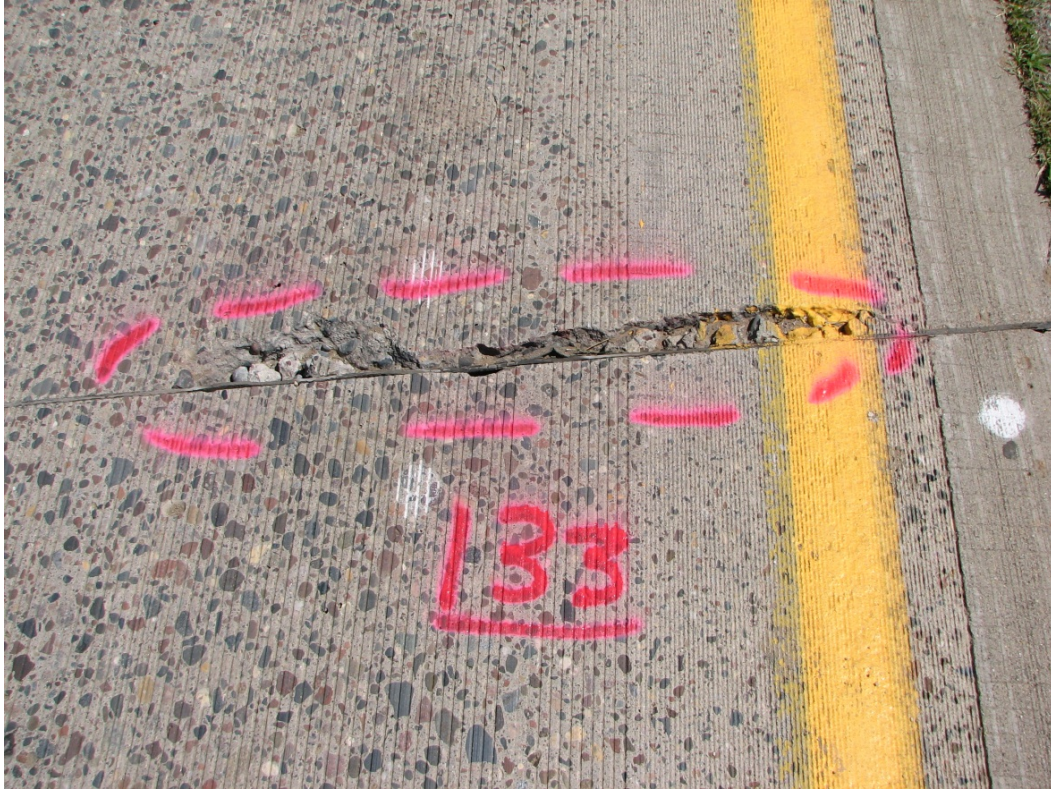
Distress near the surface of a concrete pavement along a transverse joint.
